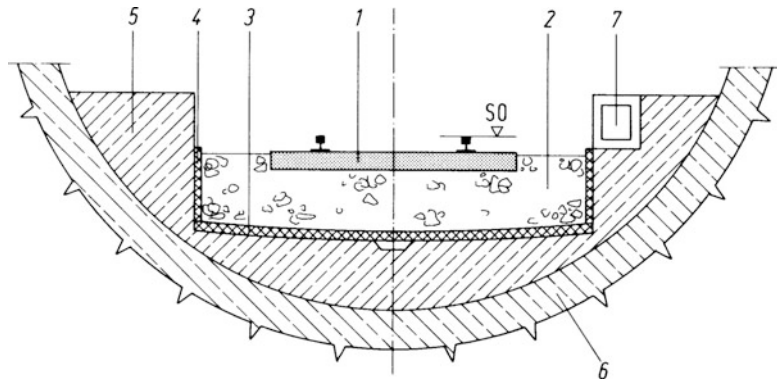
Outline sketch of ballasted track construction with ballast mats based on the example of a single track light rail tunnel with a circular cross section. 1 track frame, 2 ballast bed, 3 ballast mat (BM), 4 side mats, 5 top concrete (escape route on side), 6 tunnel walls, 7 cable routing duct
